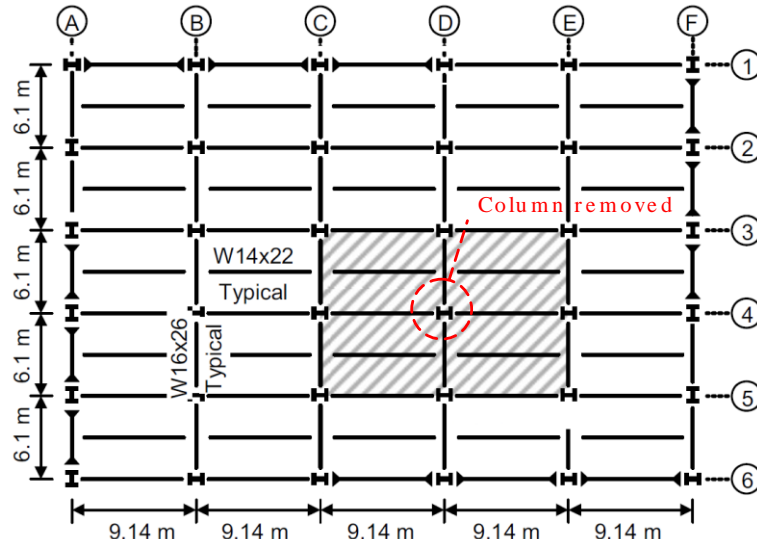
Floor layout of the NIST prototype building, area of floor system studied (hatched) and location of internal column removal
